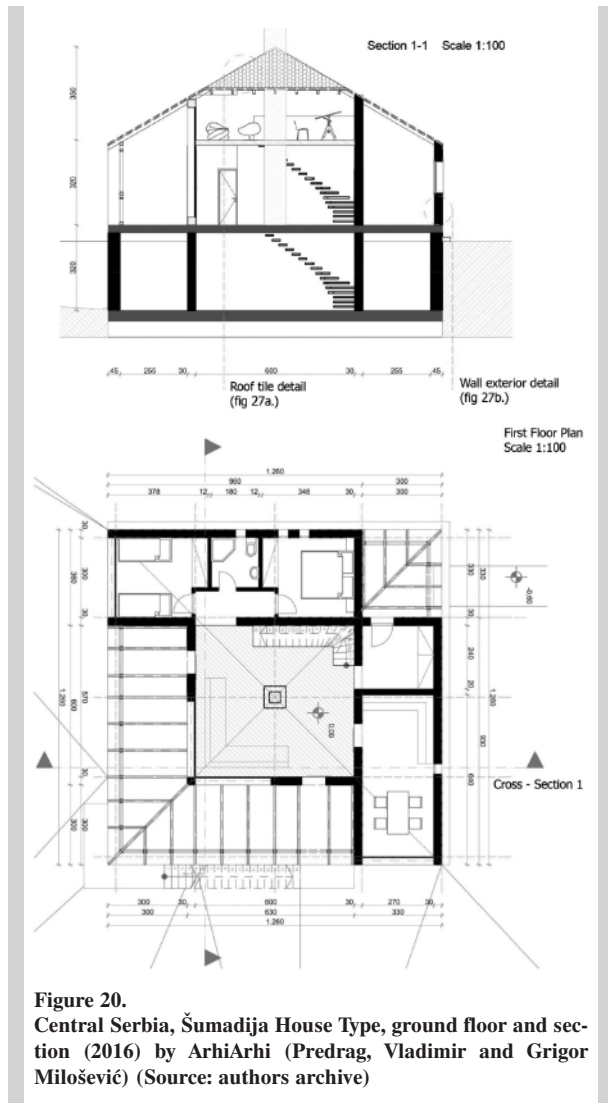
Central Serbia, Šumadija House Type, ground floor and section (2016) by ArhiArhi (Predrag, Vladimir and Grigor Milošević) (Source: authors archive)
